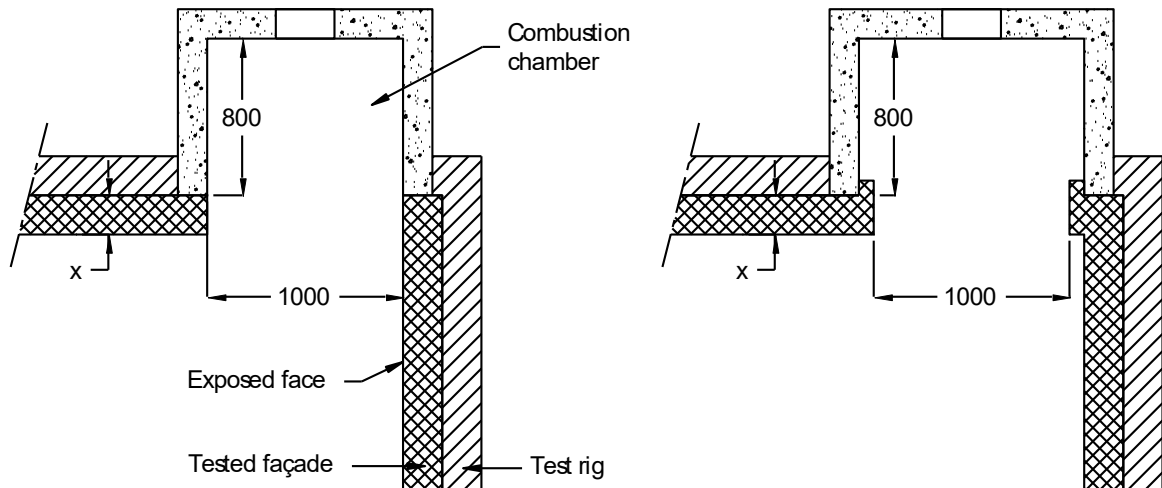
Horizontal section of the detailing at the edges of openings schematically exemplified. The general closing configuration is shown on the left, the detail as in practice is shown on the right, x refers to the actual thickness of the tested façade.
